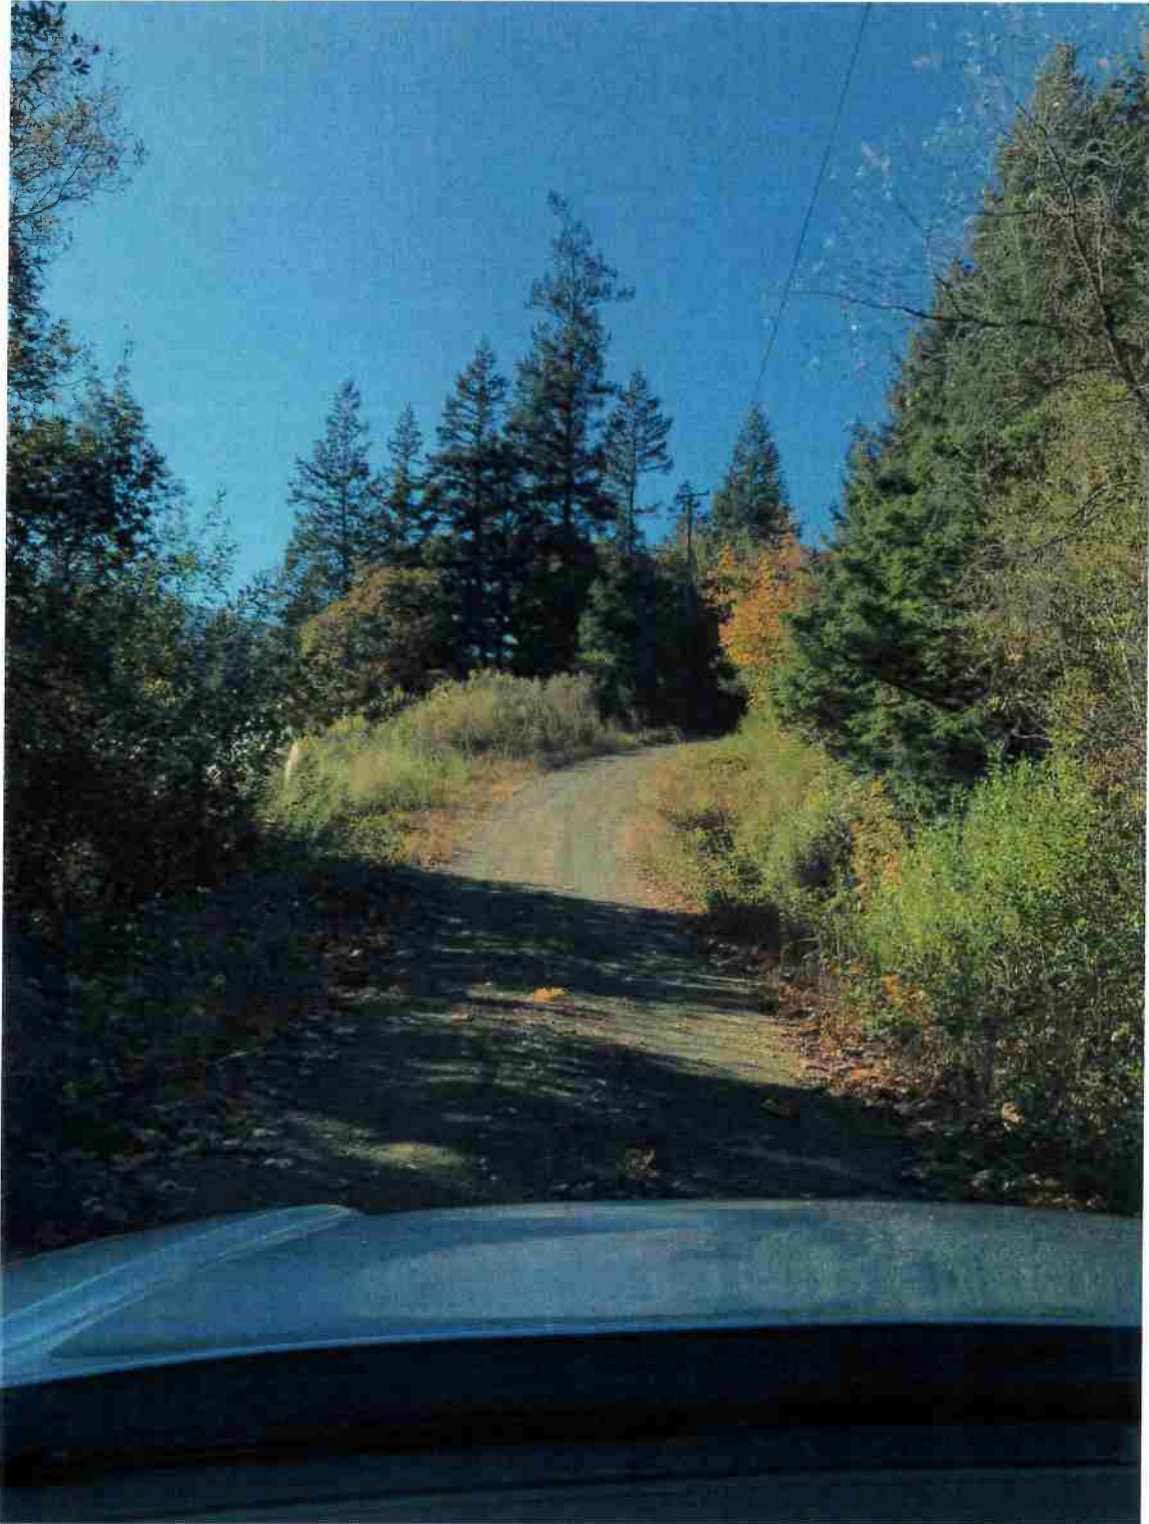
14'-wide travel way, no shoulder, gravel surface, no inter-visible turn outs.
